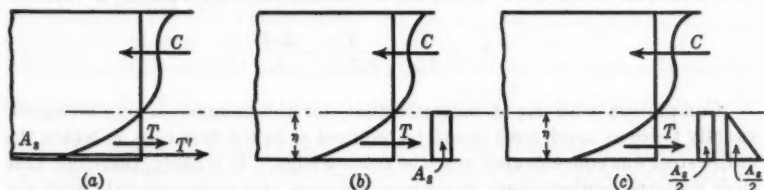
PROPOSED ARRANGEMENTS OF TENSILE REINFORCEMENT
